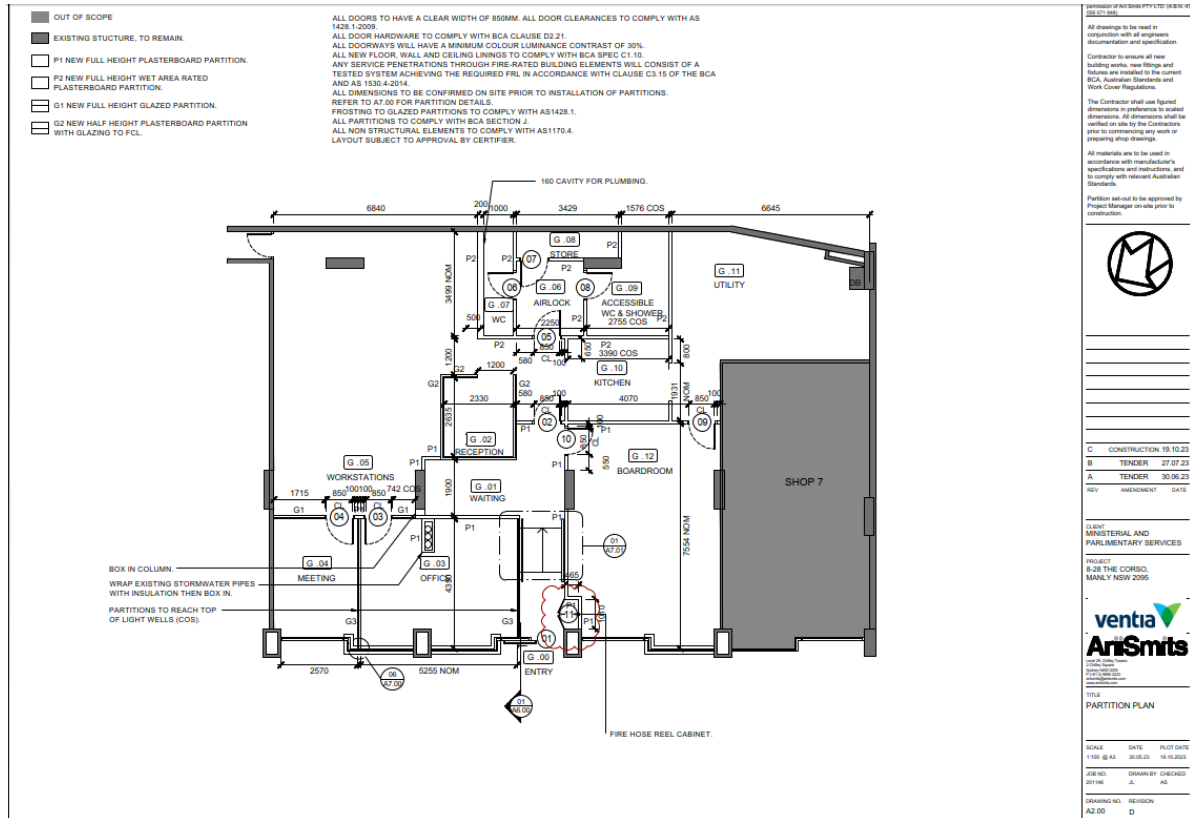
Proposed Partition Plan showing the intended layout of interior spaces within the tenancies.
